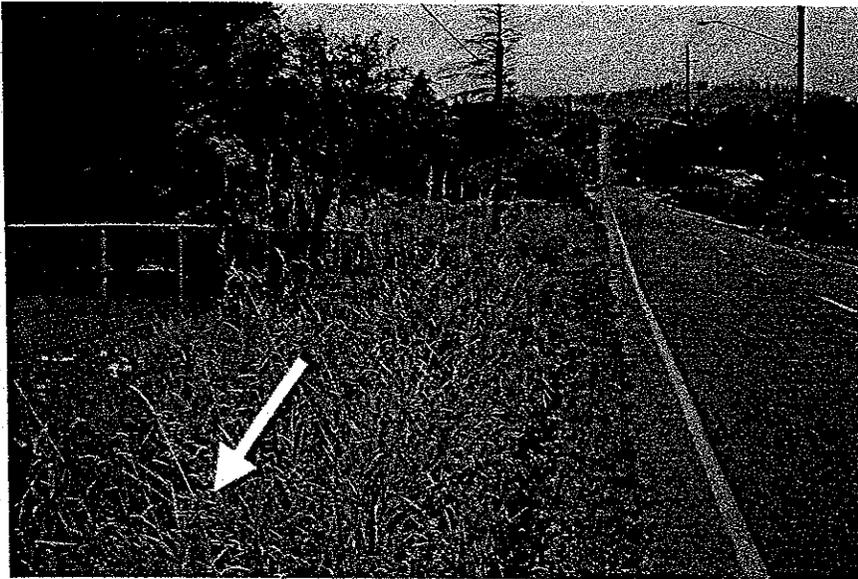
Looking north at drainage ditch paralleling Sultan Basin Road. Drainage flows south.
